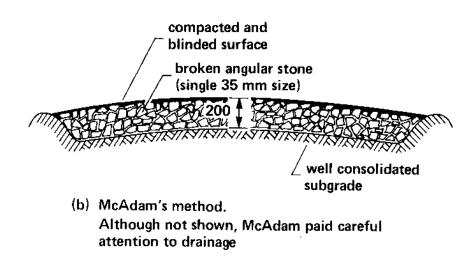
McAdam's method form of early road construction (Source: Holland & Lay 2001, pp. 348)
